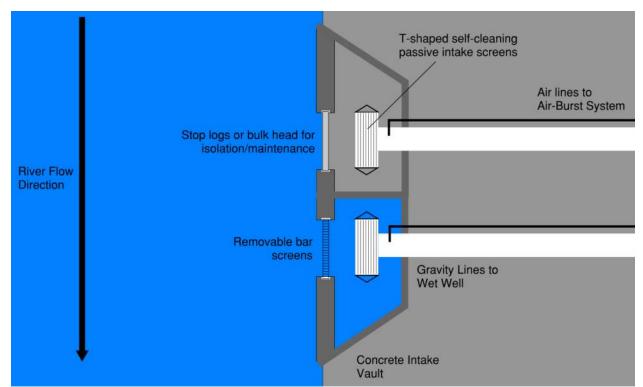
Plan View of Protective Concrete Intake Screen Vault
